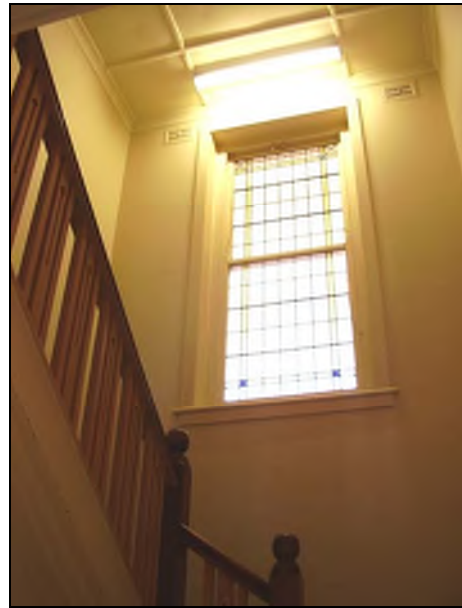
The first floor landing. The upper level also retains the double loaded layout and details including timber joinery.
